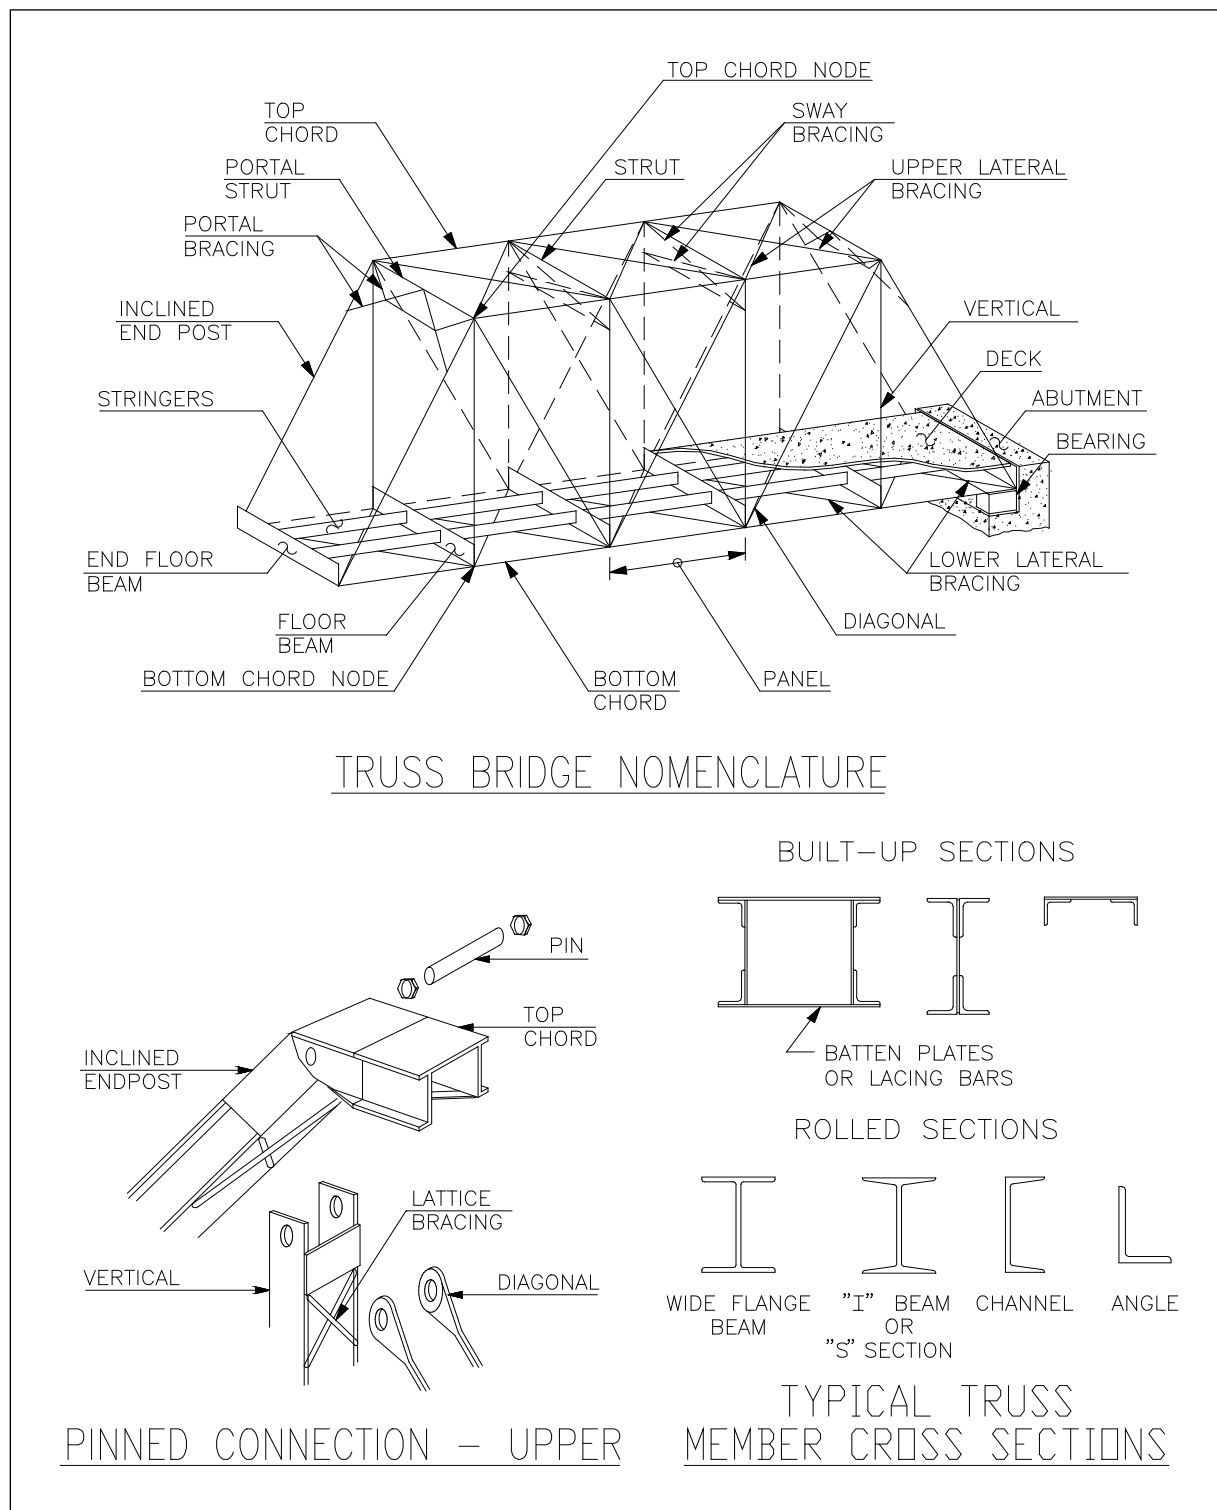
Truss Bridge Nomenclature and Details.
